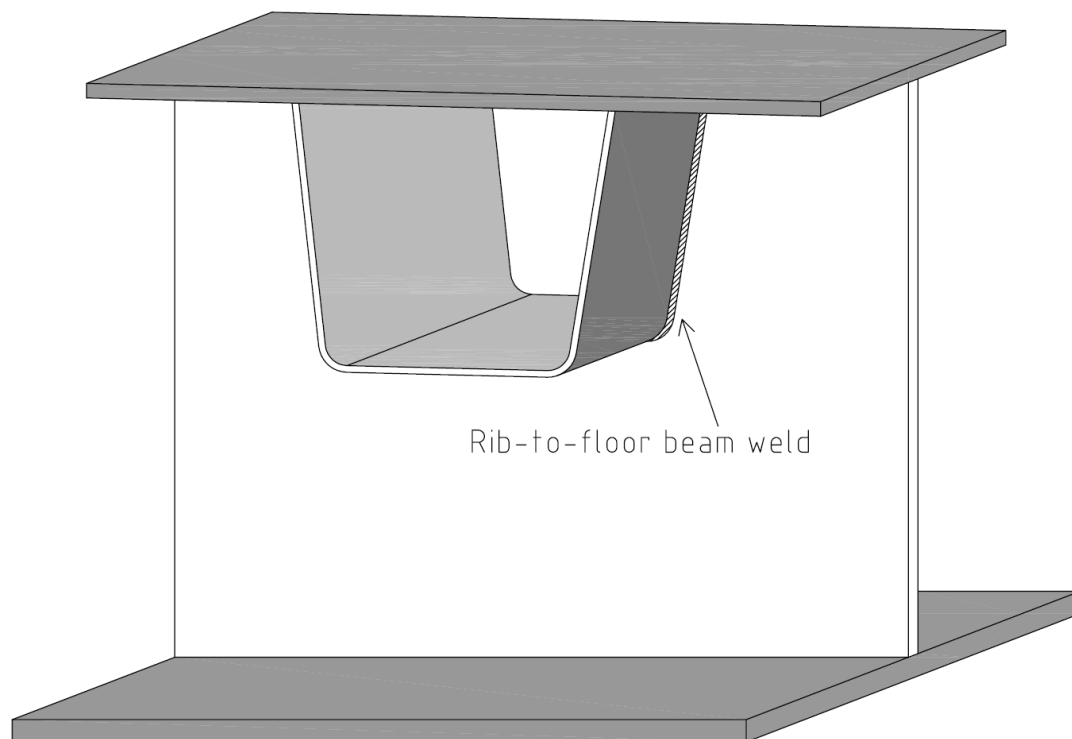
Illustration of the rib-to-floor beam weld
